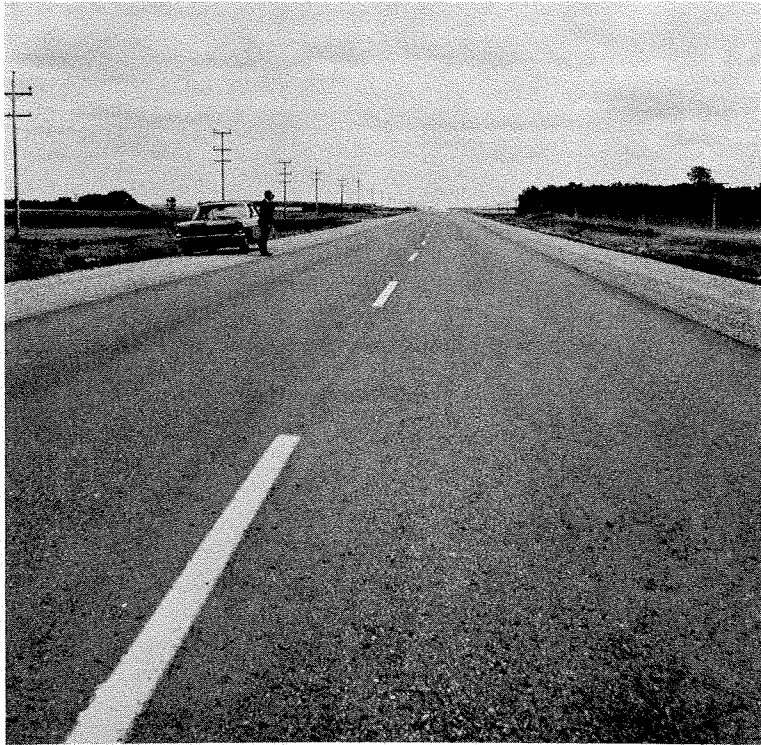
SC 3000 (SC 5) Pavement, located near Morden, Manitoba, constructed in 1965.
